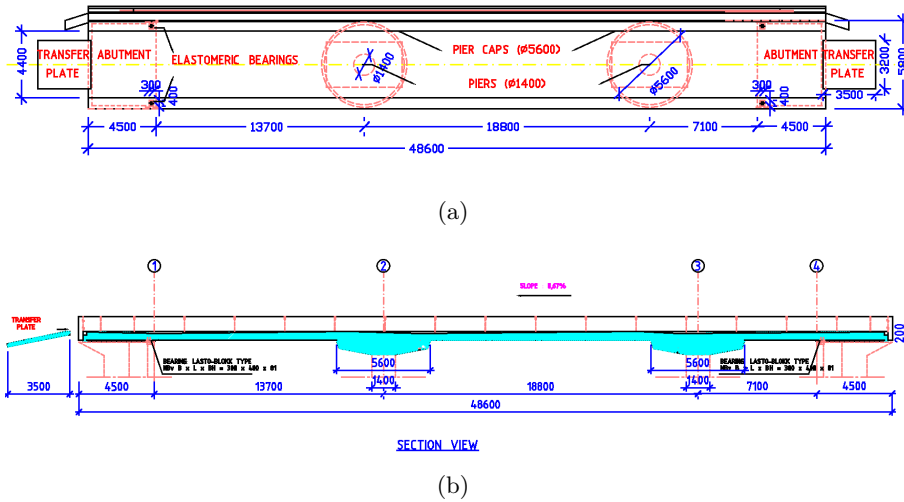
(a) Plan and (b) elevation view of the Stange Overpass
